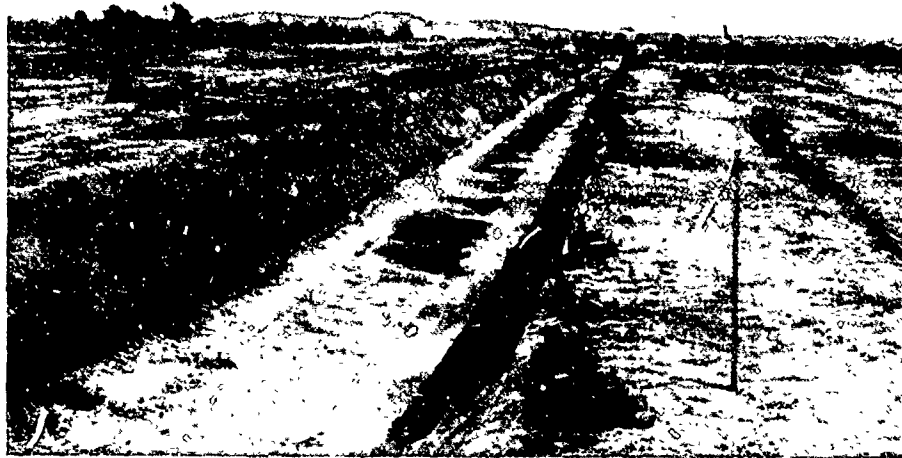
Right Abutment inspection trench looking east (Upstation)
